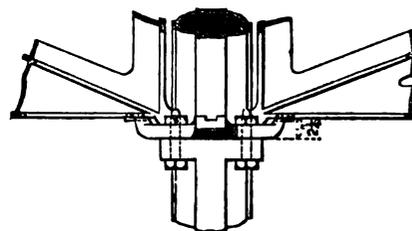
Elevation of Lower Portion of Connecting Piece, showing its attachment to a Column below, and to the Girders at the sides.
